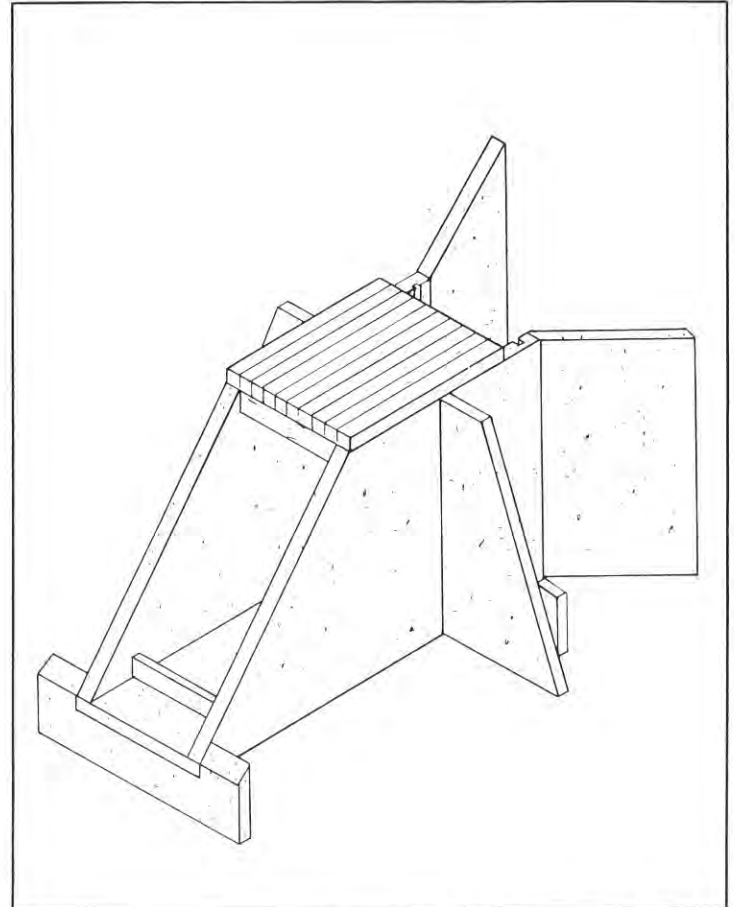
CONCRETE WEIR TYPE SPILLWAY
